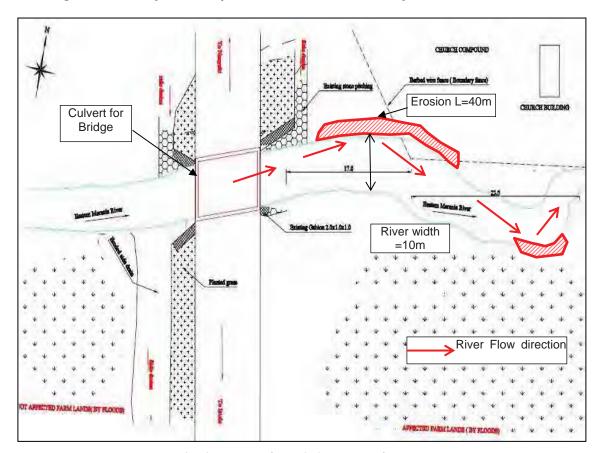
Rough Plan View of Eroded Section of Eastern Marania River
